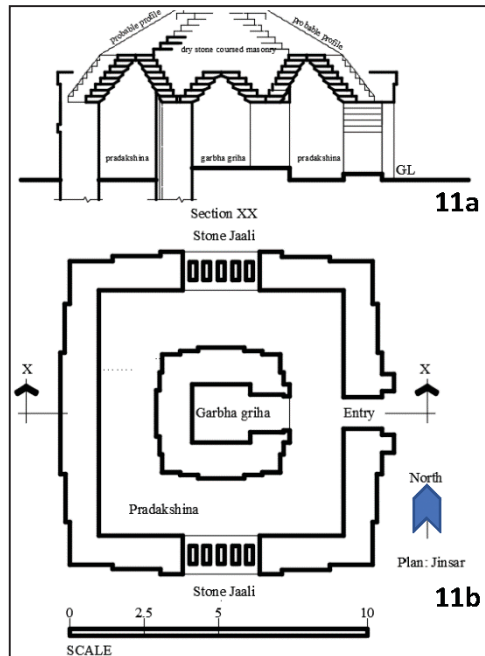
Sketch (a) section and (b) plan of the temple at Jinsar (source : author)
